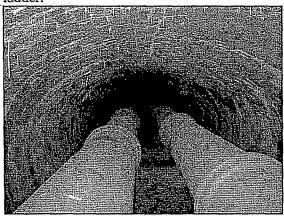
Interior tunnel arch ceiling, note efflorescence at mortar joints
